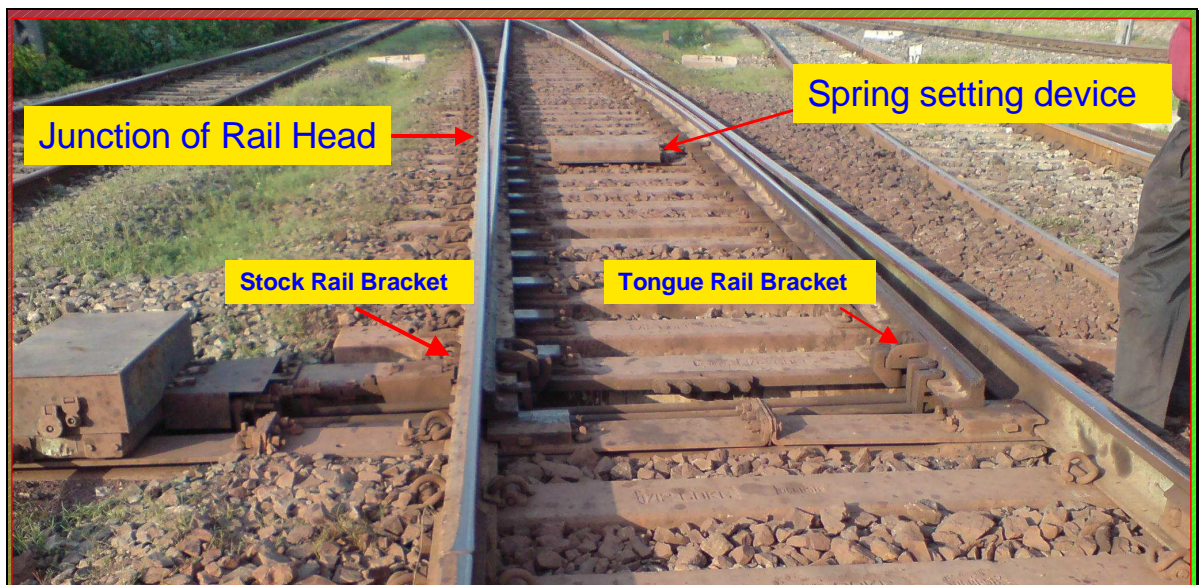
IRS-CLAMP TYPE POINT MACHINE LAYOUT WITH TWS
